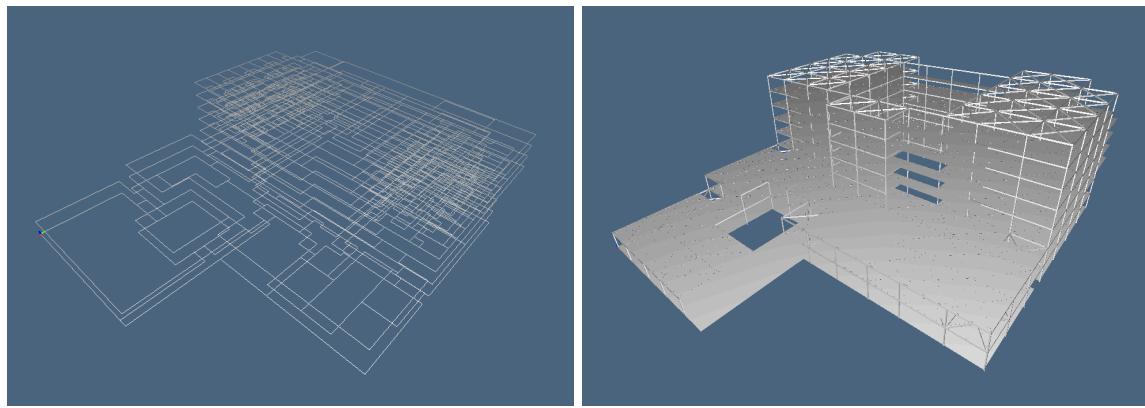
2.5D building assembly: (a) 1-skeletons of 2D floors embedded in 3D; (b) 2-skeletons of floors and 3D structural grid.
